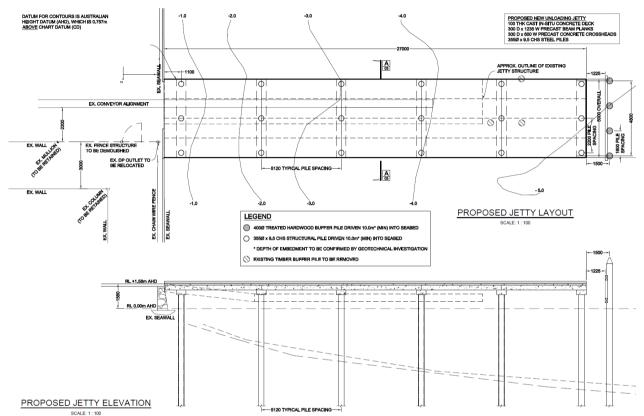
Proposed jetty layout and elevation. Gippsland Ports Drawing No. 23-417_LEFL-ULJS-02
